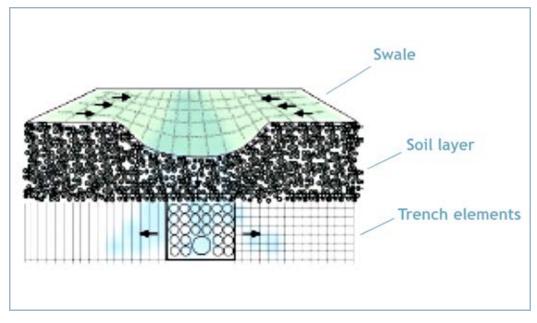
Cross section in a swale-trench infiltration system (Adapted from fbr).
